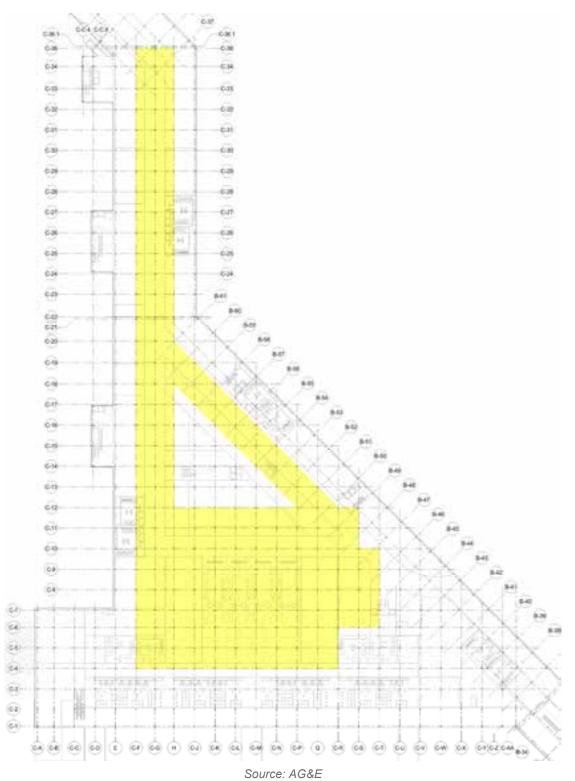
Proposed Area of Discontinuous Columns and 2-Bay Roof Spans
